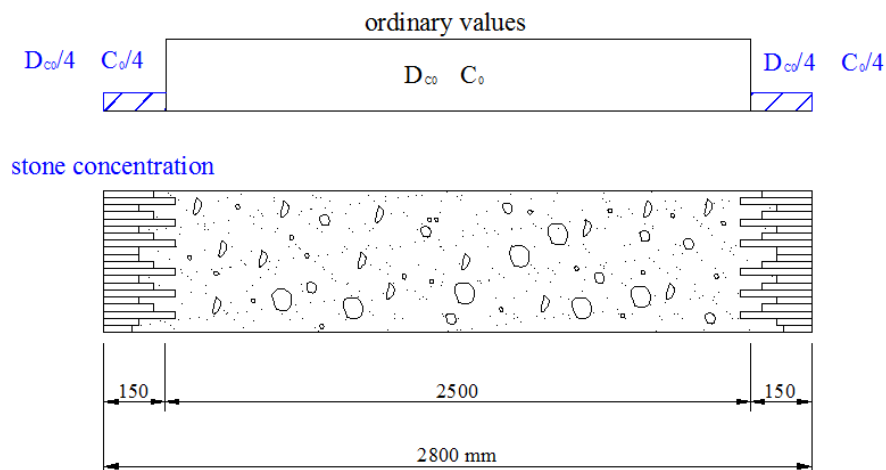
Pavia tower - Cross section of a wall (adapted of Ferretti and Bažant (2006a) and Anzani *et al.* (2009))
